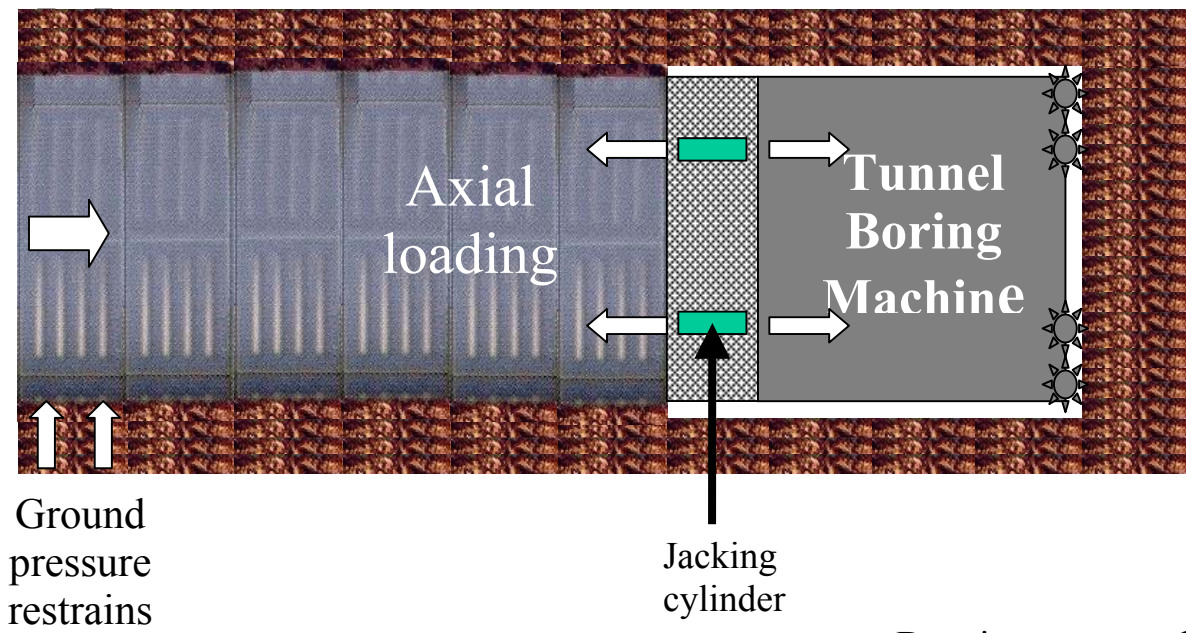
Diagram of axial loading of tunnel liner plate due to jacking forces associated with advancement of the miner.
